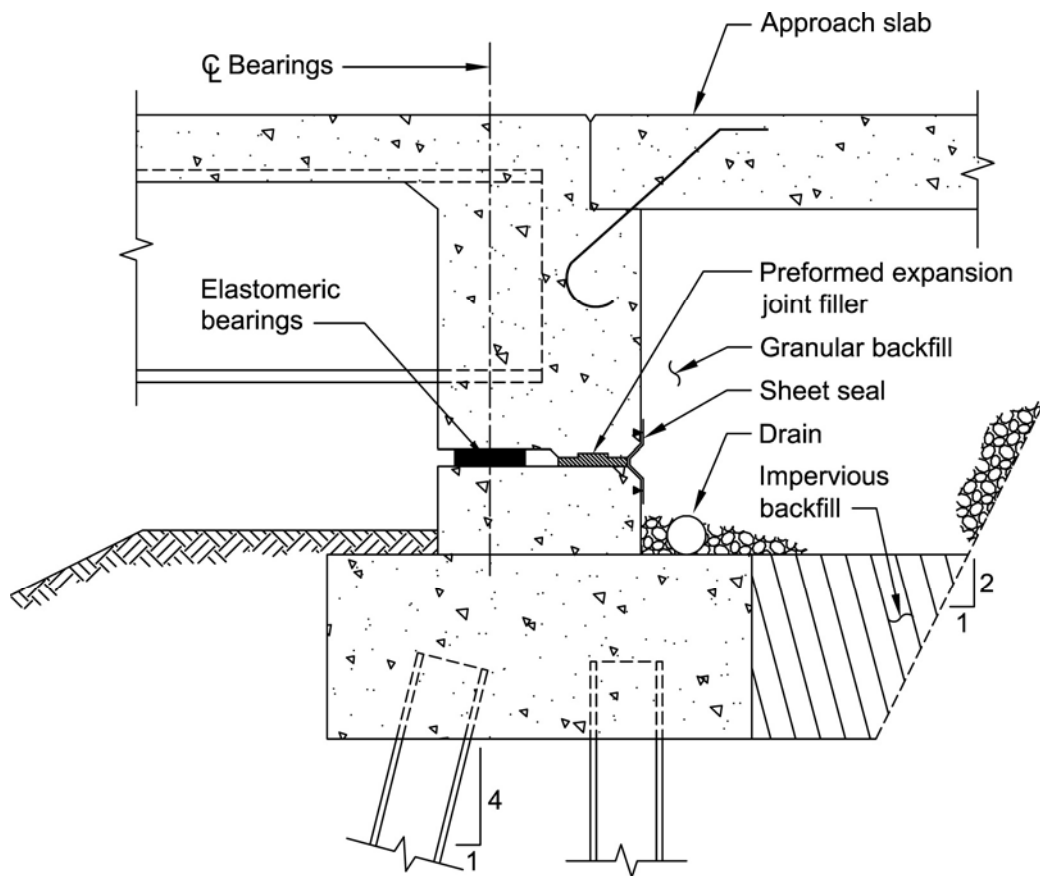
A semi-integral abutment concept for single- and multiple-span continuous bridges.⁽⁵¹⁾
